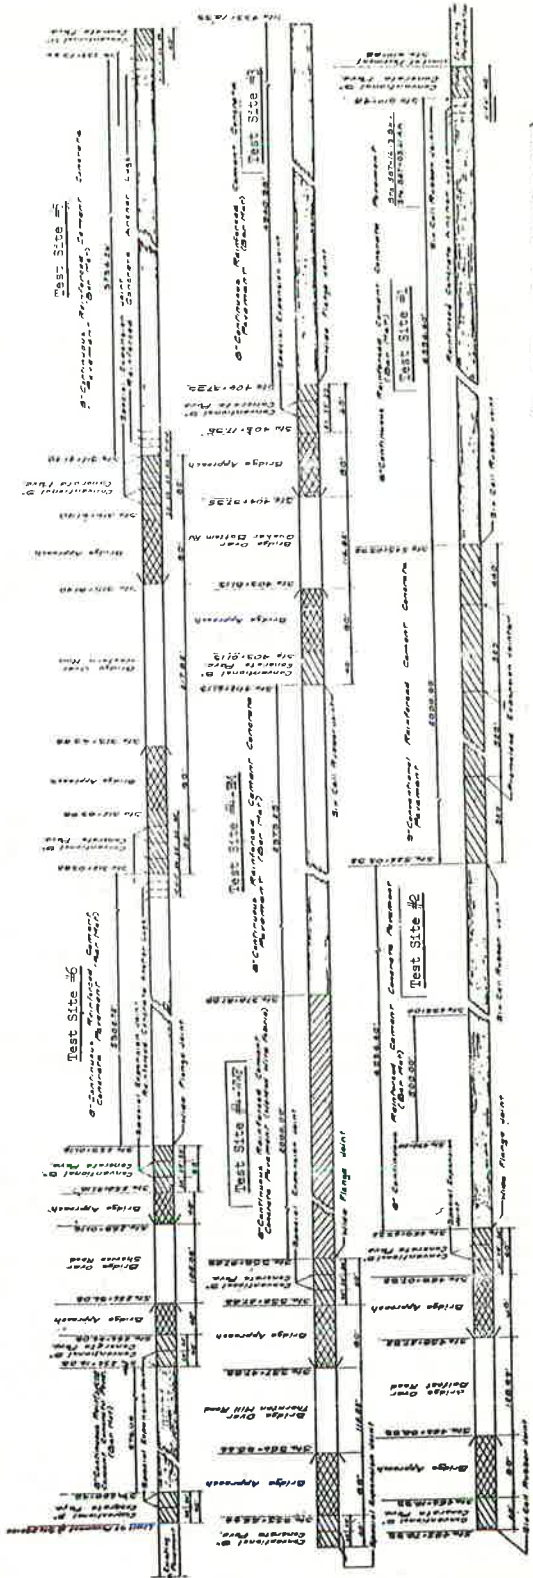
Proposed pavement layout of Interstate I-83—Baltimore-Harrisburg Expressway (Southbound Roadway only).
